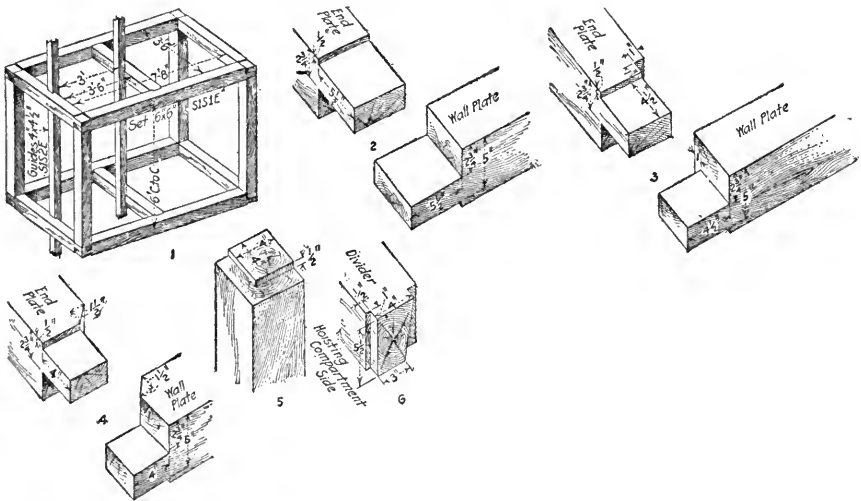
SHAFT SET OF LIGHT TIMBER AND DETAILS OF JOINTS.
